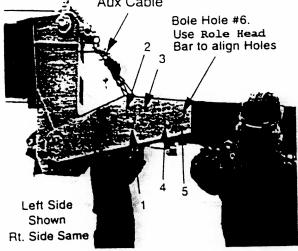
Raise Lead Sections and Align Holes in Adapter Plates with Holes in Top Lead Section
